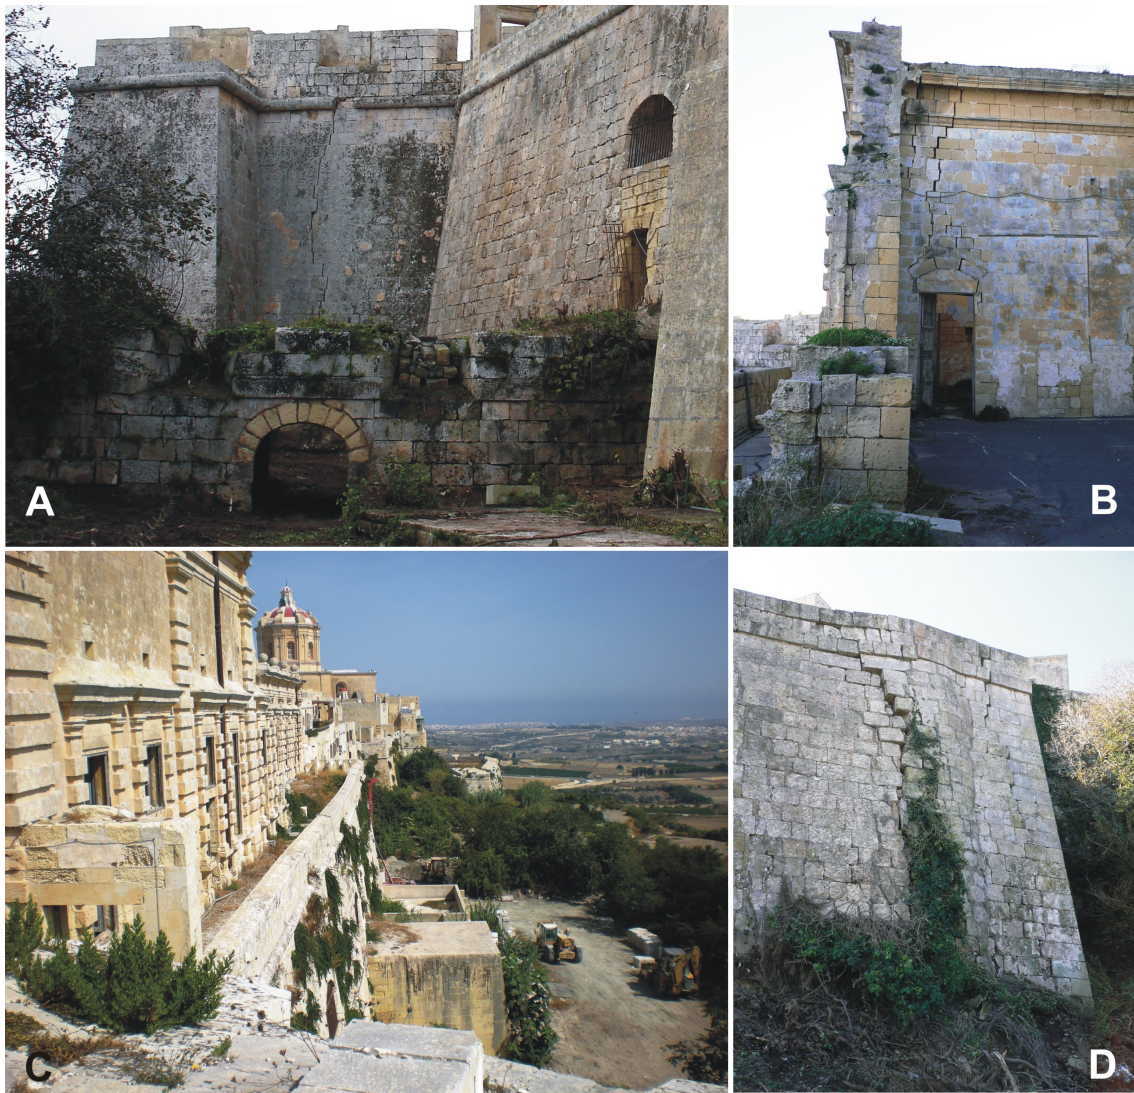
Structural damages affecting Mdina bastions, walls and buildings. (A): St. Paul's Bastion; (B) and (C) : Vilhena Palace; (D): Despuig Bastion.
